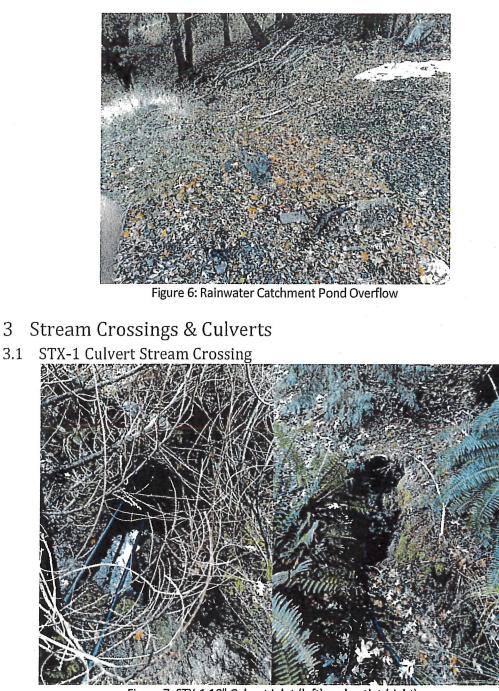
STX-1 18" Culvert Inlet (left) and outlet (right)
